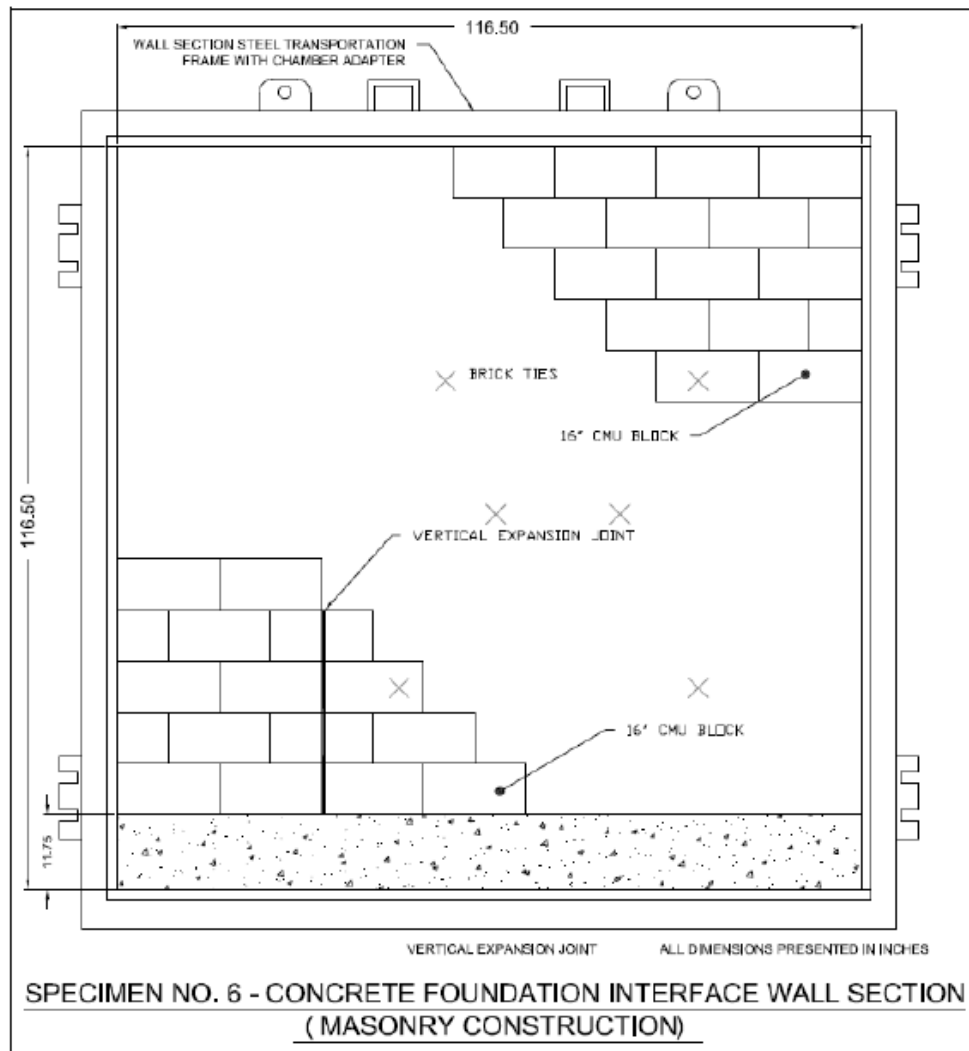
Element Specimen 20-06-B0040-CMU-CB-6 Gauge Locations
